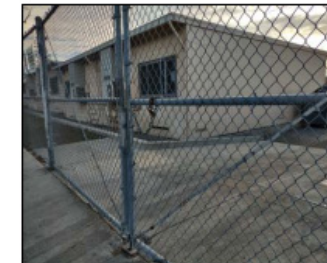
Astoria St. at Service Road Entrance; DSA Buildings to be removed
